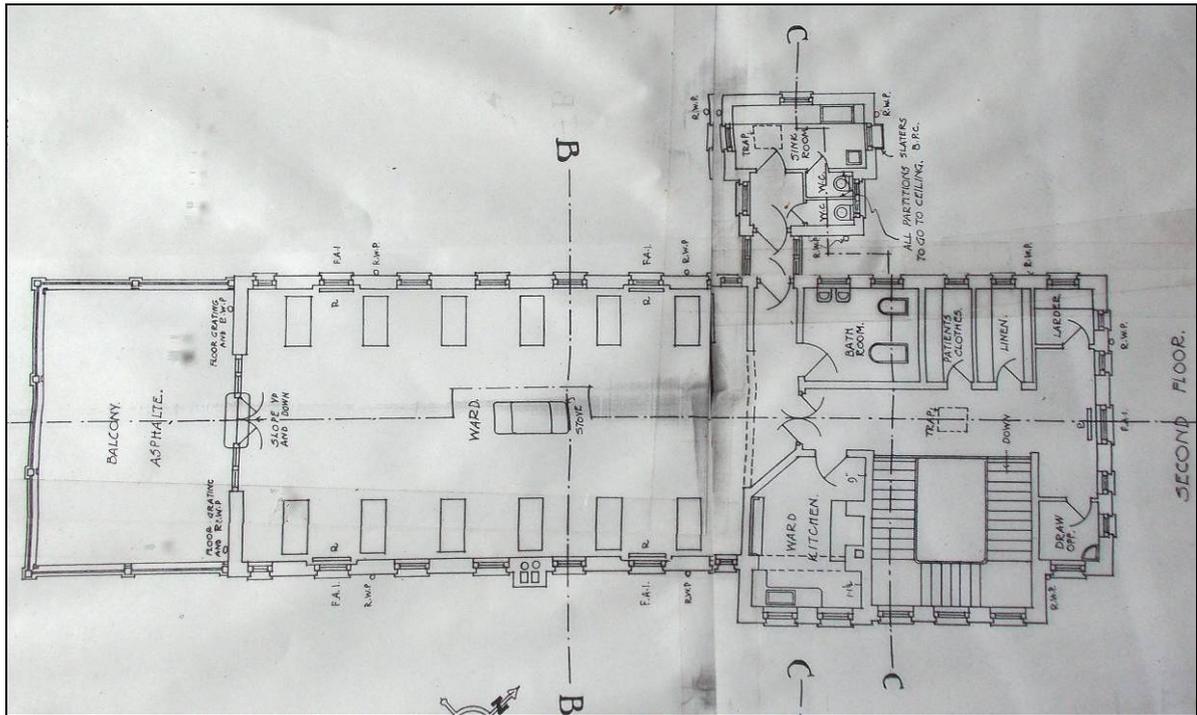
Copy of original architectural drawing of Building 41 showing the second floor.
